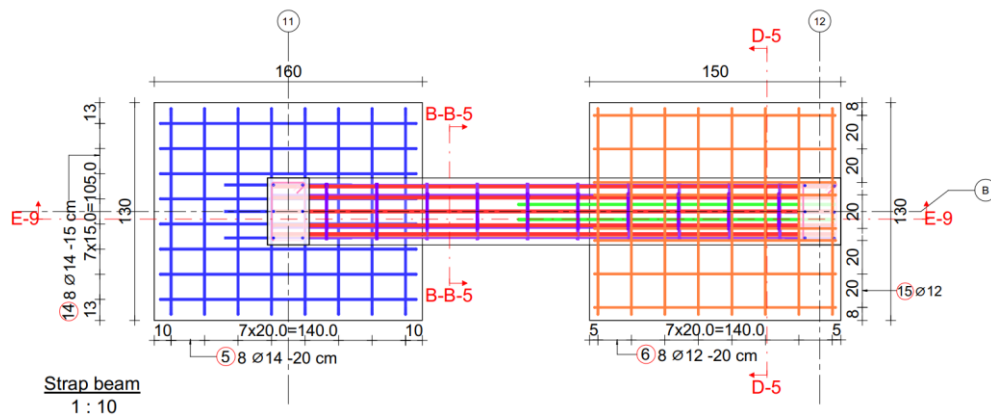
68. Horizontal steel reinforcement plan of the strap footing
